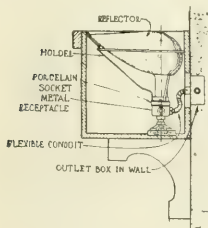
SECTIONAL VIEW OF A WALL LIGHTING BOX
